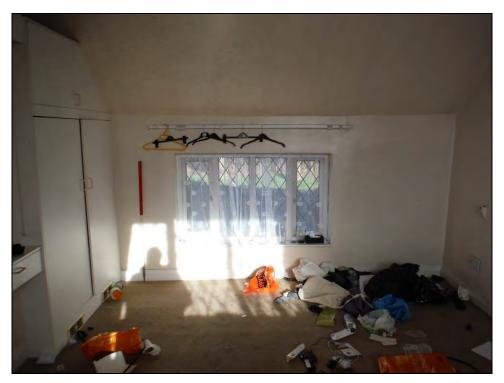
North-east wall of Room F5 (scale = $1 \times 1m$)
